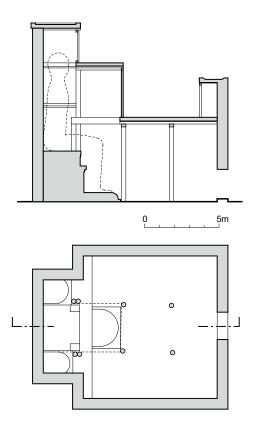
(Left) Basgo. Maitreya Lhakhang. Ground plan and section. The ground plan shows the position of the round-shaped pillars.
